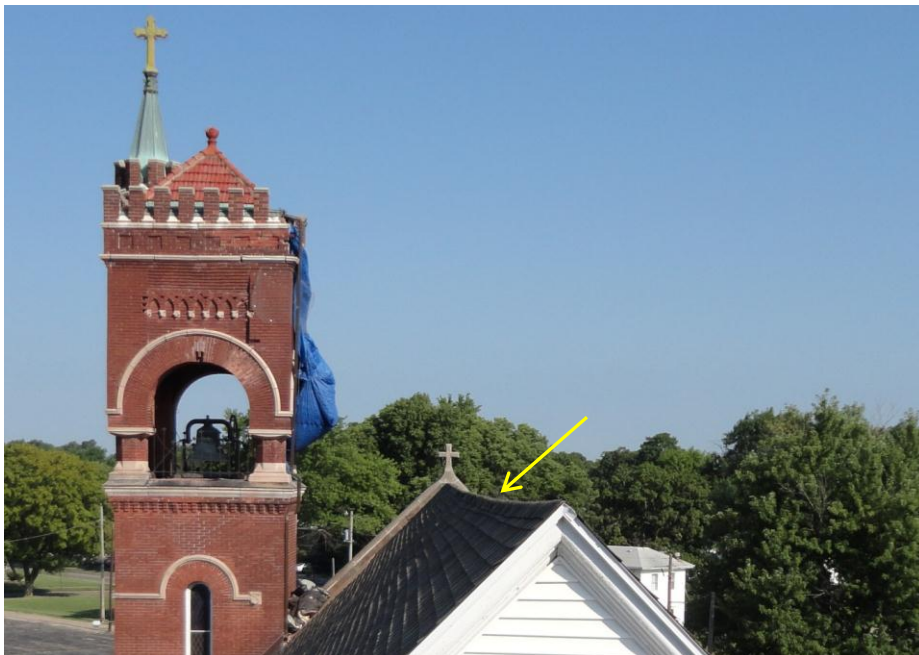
Deflection visible in ridge of main church roof consistent with outward spread of roof trusses and buttress leaning.
